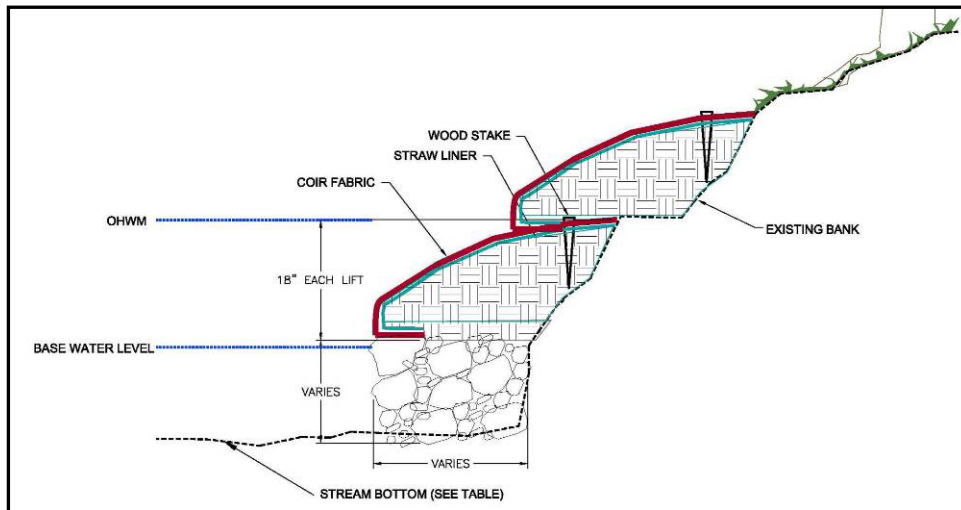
Typical stone toe and soil-encapsulated lift detail.
